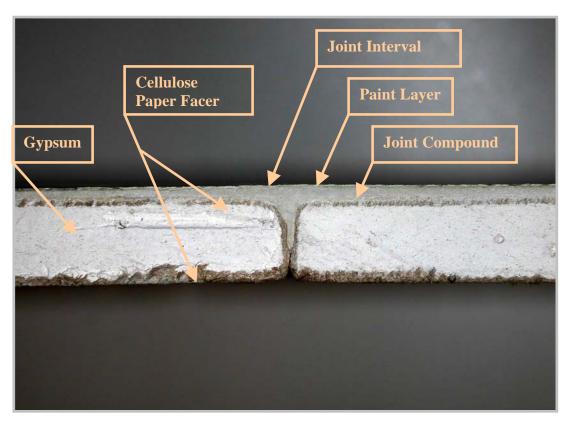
Section of ½-inch gypsum wallboard showing a multi-layered joint interval. Wallboard was obtained from Building #3607.
